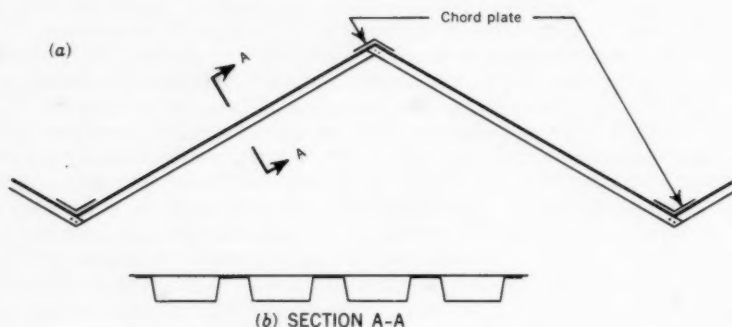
TYPICAL FOLDED PLATE CROSS SECTION
